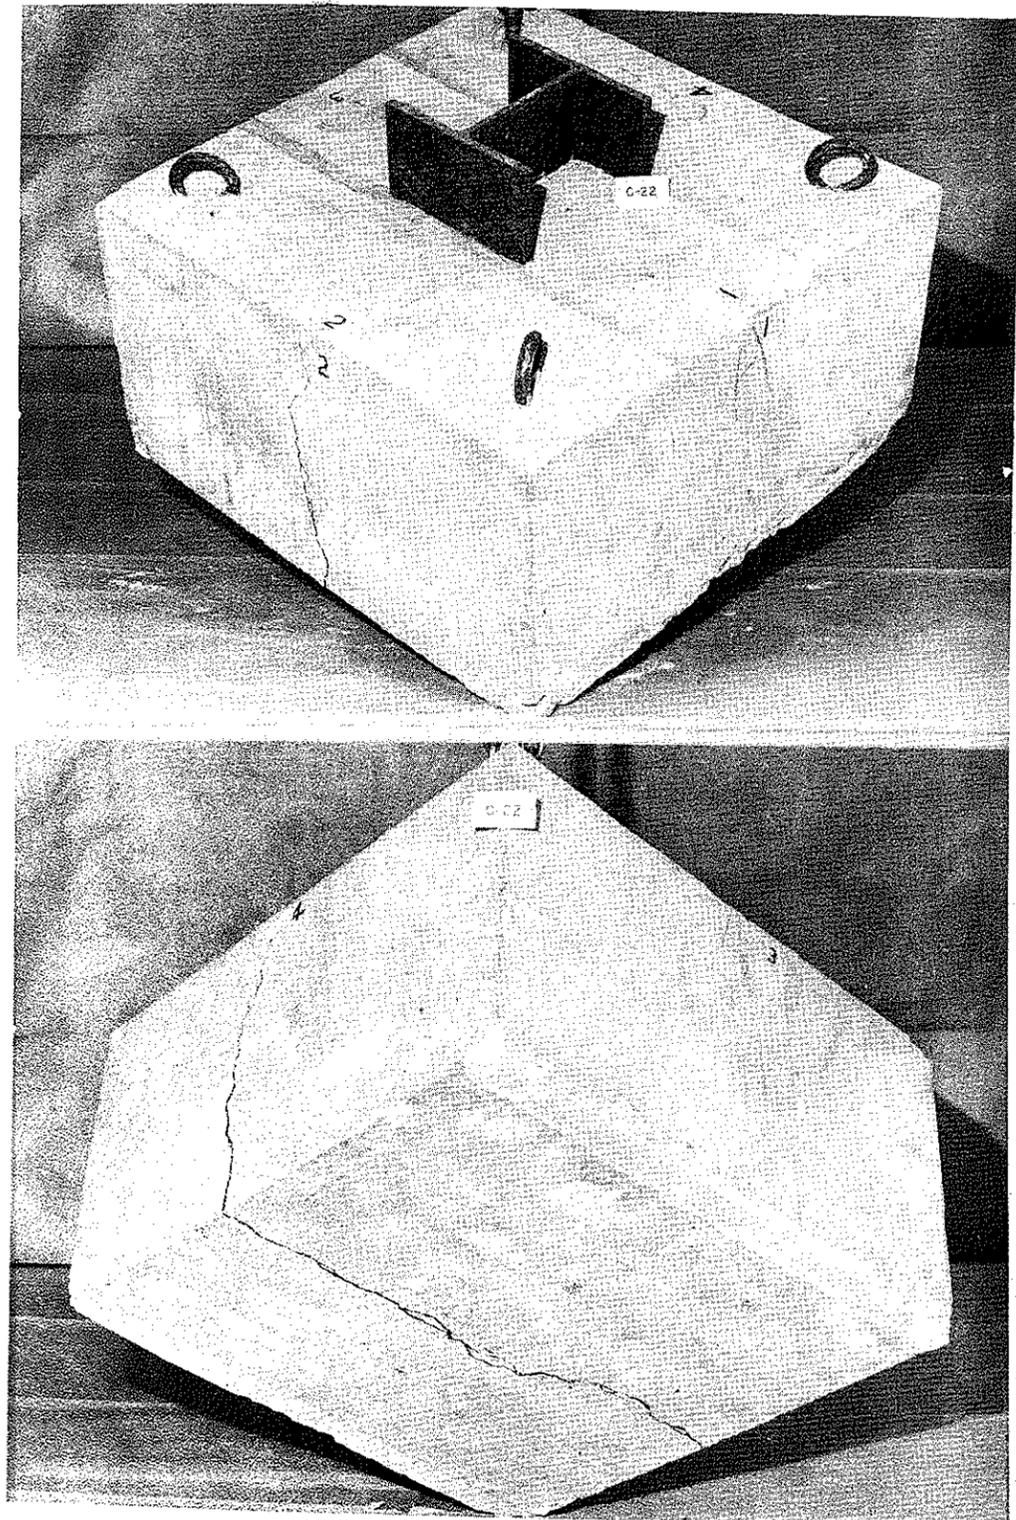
APPEARANCE OF SPECIMEN C-22 AFTER TESTING.
